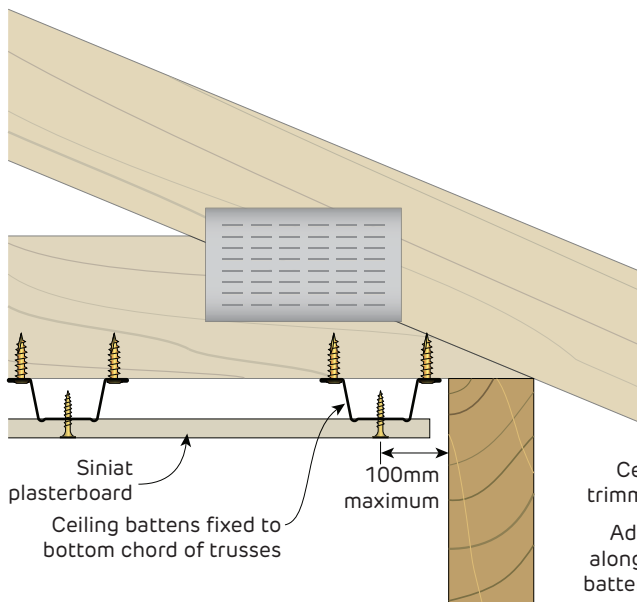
Plasterboard Ceiling Fixed to Battens
